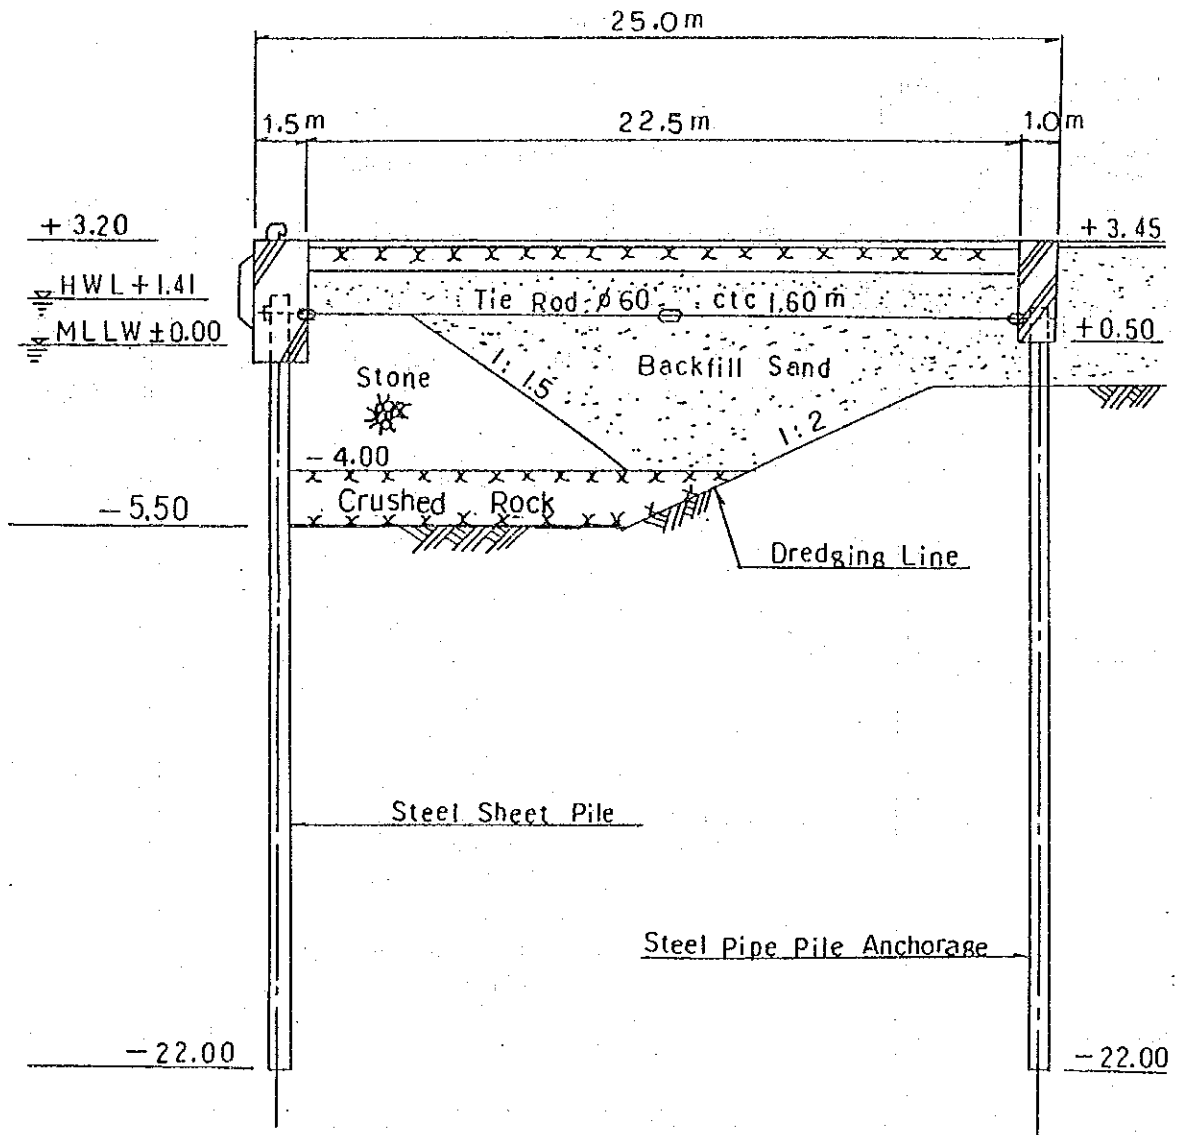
Typical Cross Section of -5.5m RO-RO Berth
